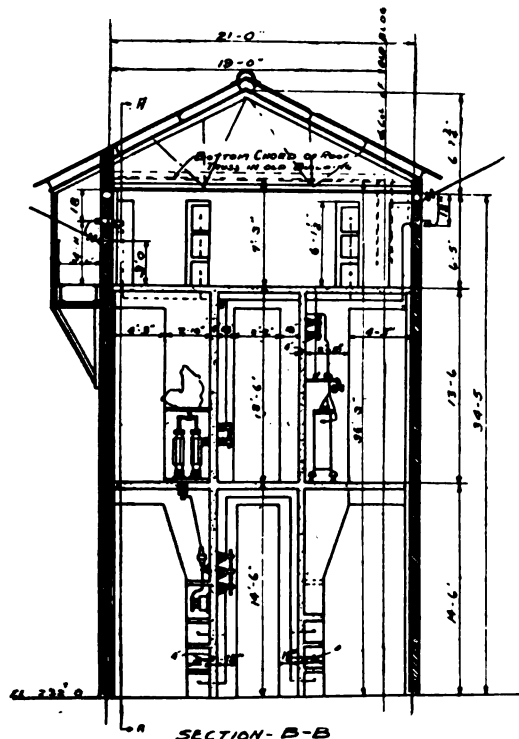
Cross section of Minsi Trail sub-station, showing duplicate busses on first floor with selective disconnecting switches. Oil switches and lightning arresters on the second floor and outgoing feeders on the third floor.
